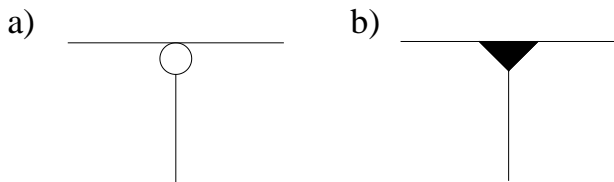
Types of joints. a) – hinge joint, b) – fixed end joint
